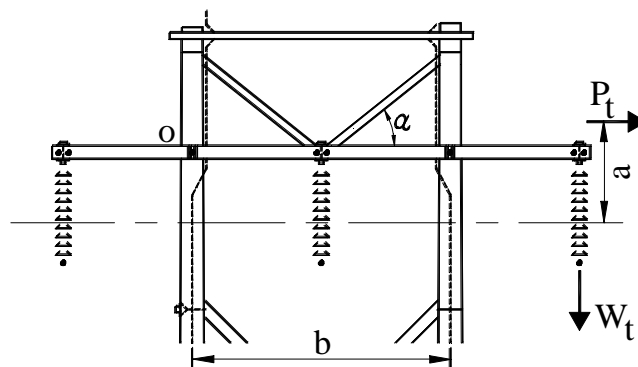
POLE TOP ASSEMBLY WITH INSIDE BRACES
